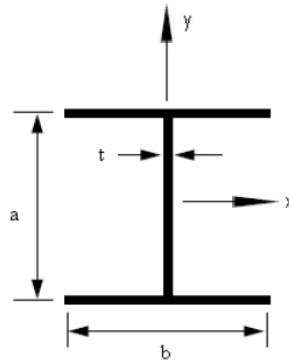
Cross-Section of Beam<sup>19</sup>
